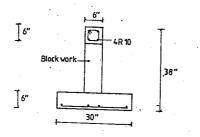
Cross section of Vierendeel foundation used for Housing scheme at Mattakkuliya
